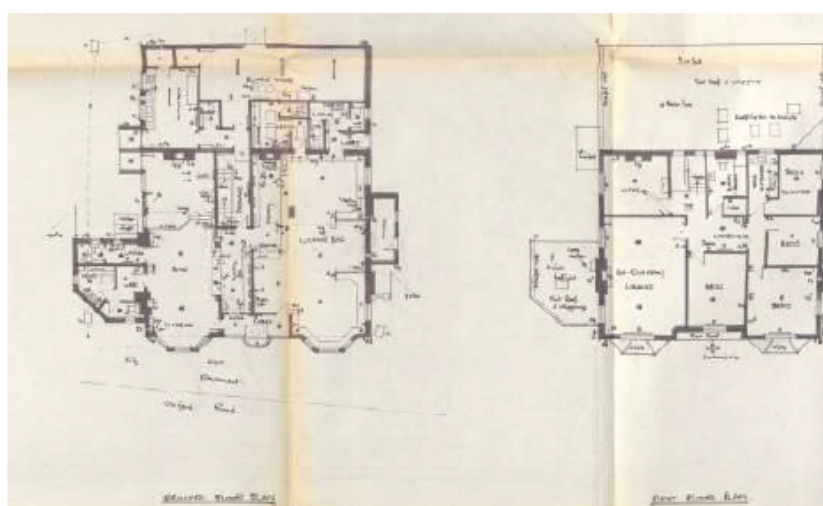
Ground and first floor plans of the subject site in 1988 showing the various internal alterations to the bar area and the extension of the building to the side and rear.
